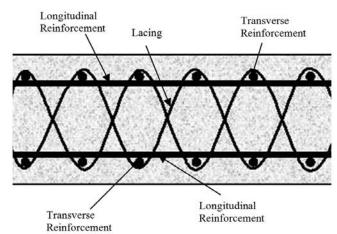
Typical laced reinforced concrete (LRC) structural element.
